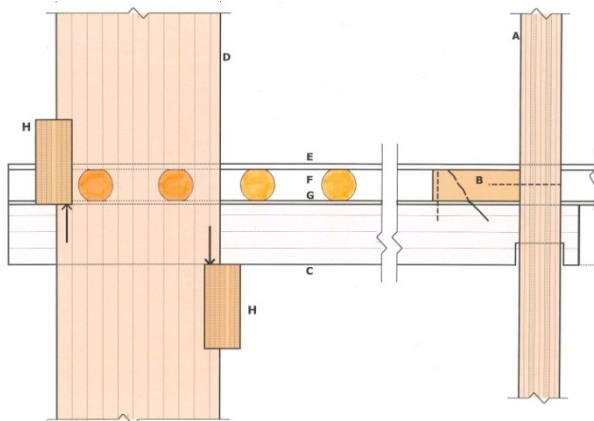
Floor Beam Elevation, A – IPC (integrated panel core), B - 'hoop' beam (Screw fixings to IPC and floor beams are indicated), C – engineered timber floor beam (loose notch indicated at IPC to allow rotation), D – engineered timber column, E – flooring, F – floor joists, G – ceiling, H – corbels to transmit beam moments to the column.
